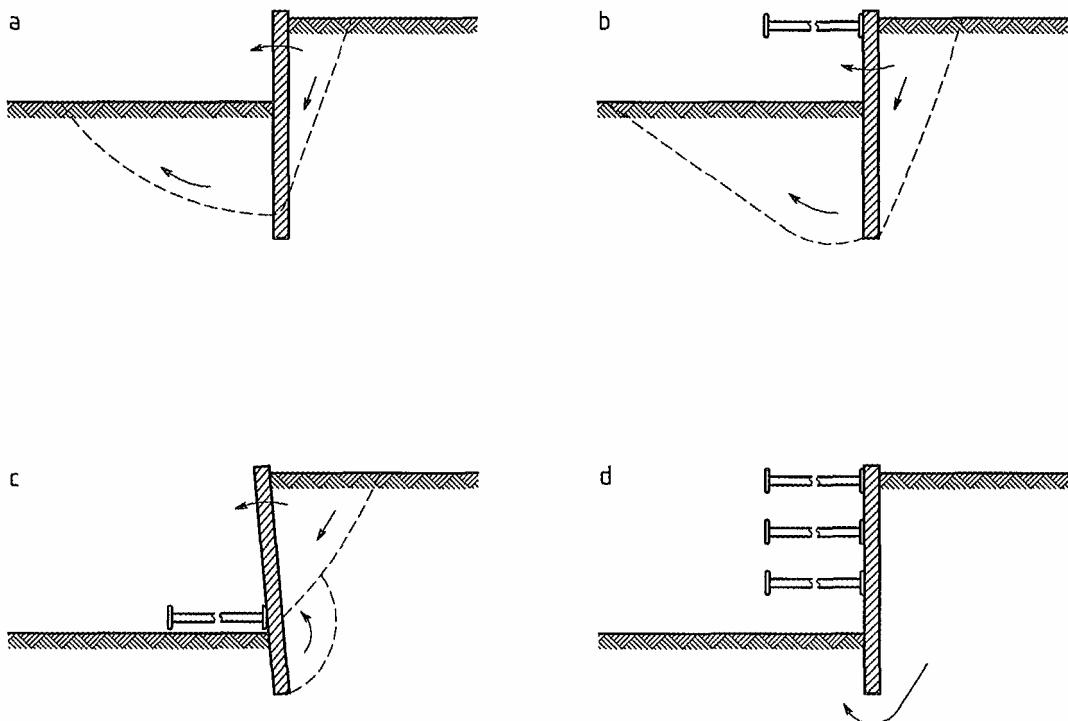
Examples of limit modes for rotational failures of embedded walls
